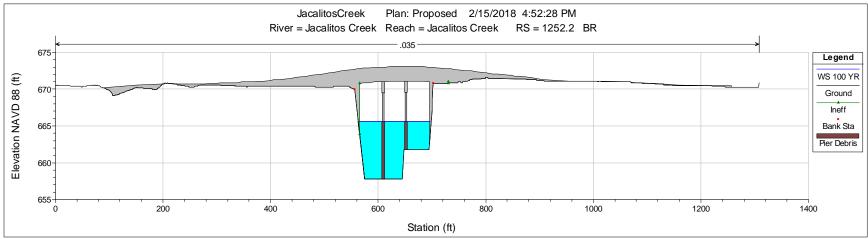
Upstream Face of Proposed Bridge, Looking Downstream (North)
